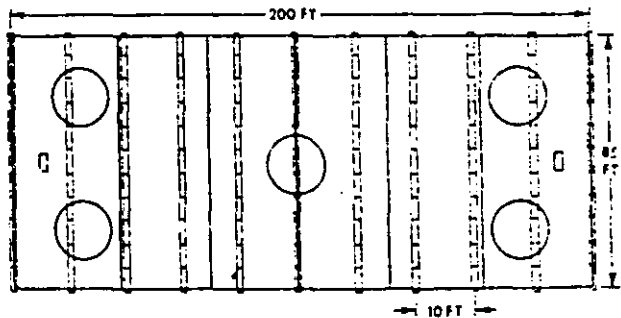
Typical lighting layout of semi-direct fluorescent luminaires on an indoor hockey arena.
